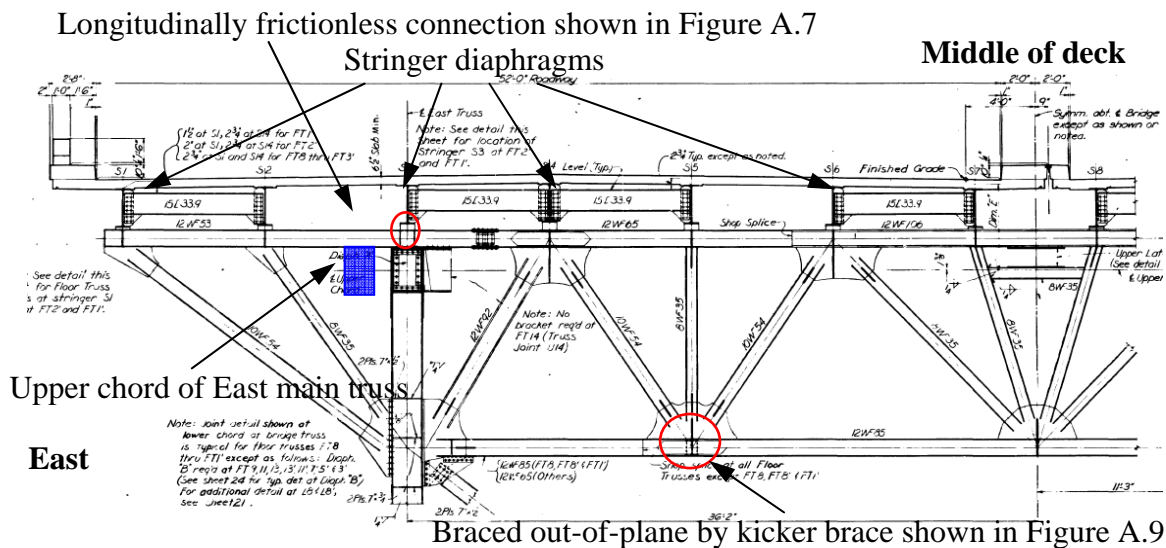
Cross-sectional view of concrete deck and floor truss (from Mn/DOT 2008).
